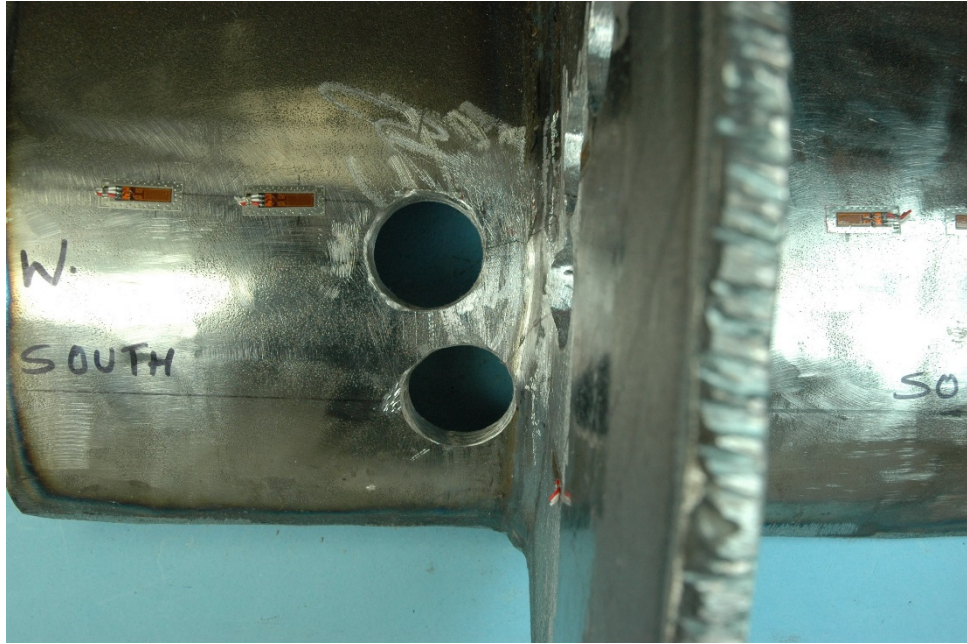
Portion of rib and floor beam containing the south side crack cut out of the mock-up specimen MU3
